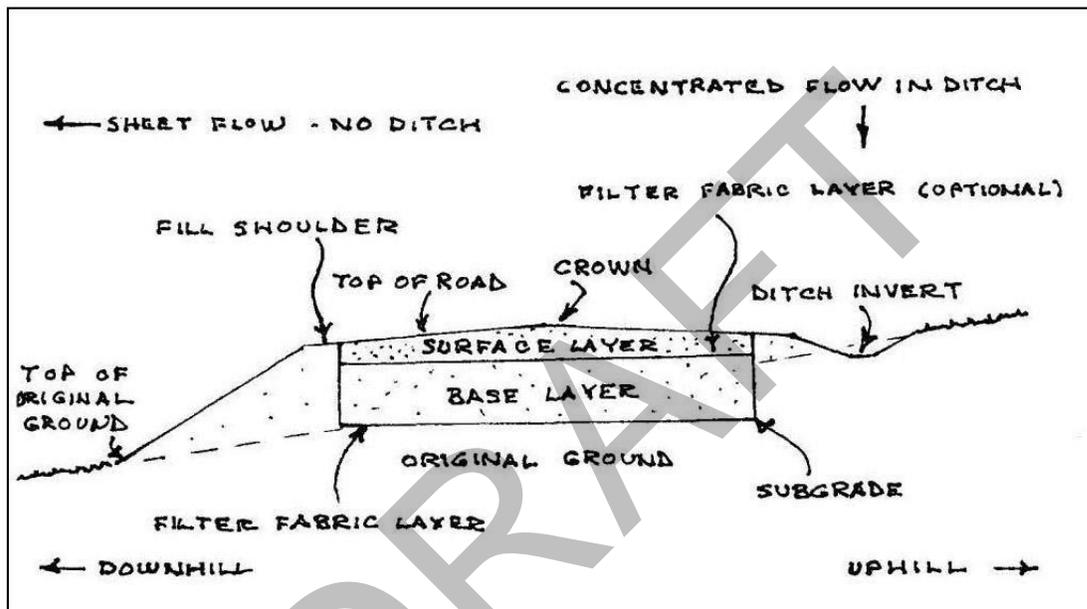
Typical Road Cross-Section – Canaan, NH Highway Department
